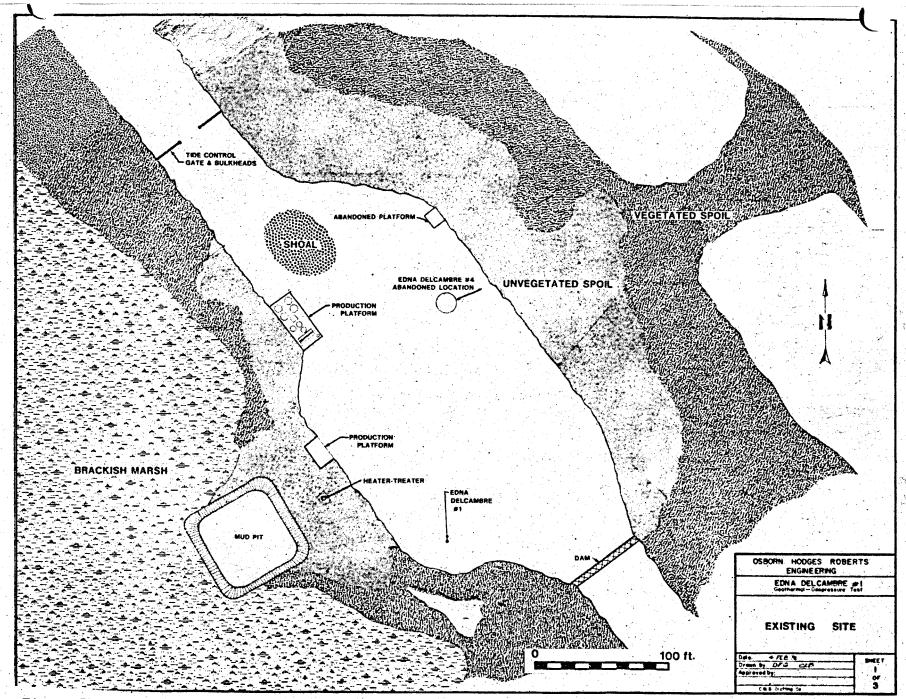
Existing Site Diagram, Edna Delcambre #1.
